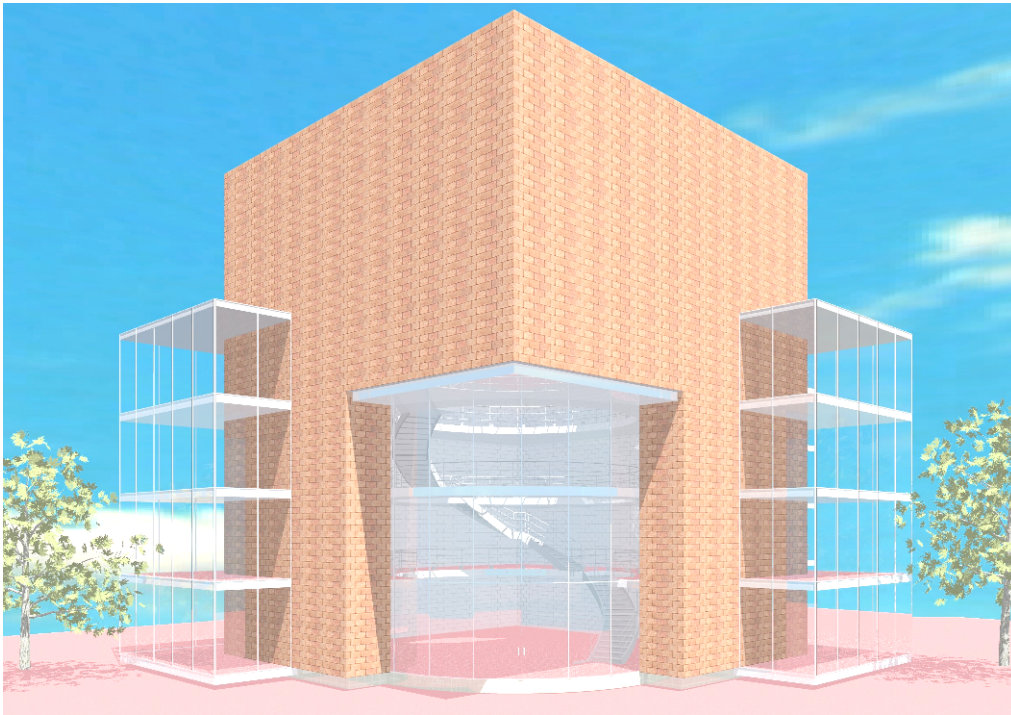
Rendered exterior view for exercise Office Building 2 project
